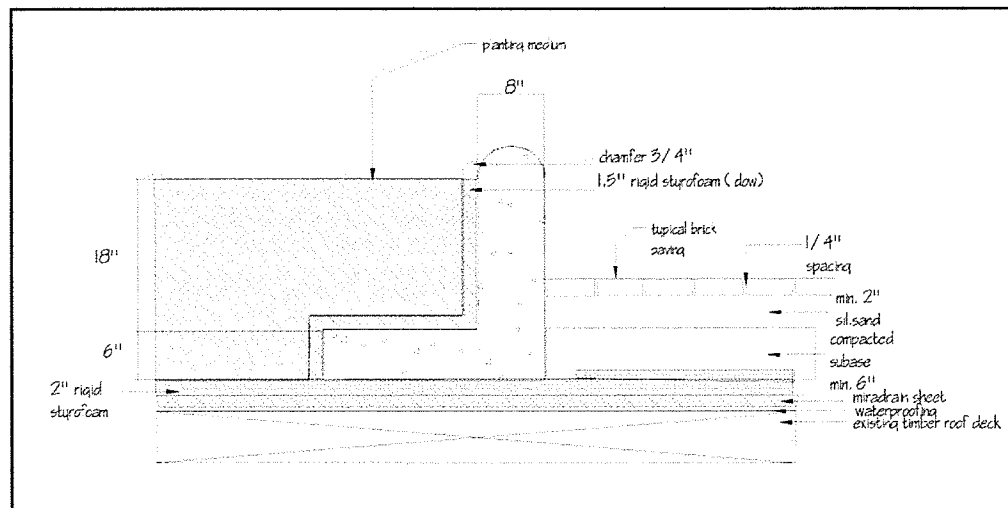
Planter and Paver Detail Built up from Roof Deck
